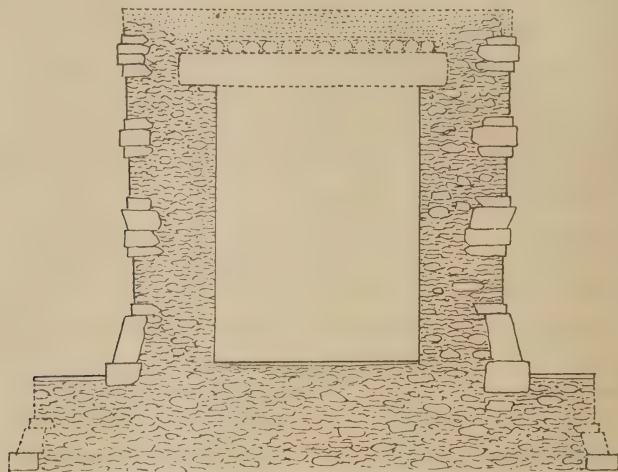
TRANSVERSE SECTION OF BUILDING OF SINGLE BEAM SPAN.
